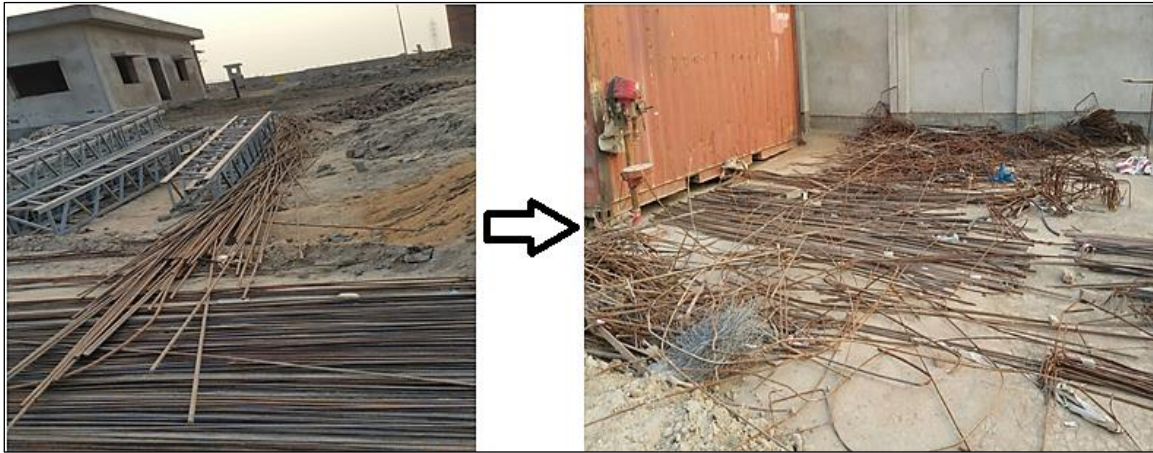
Reinforcement (Steel) before the Laying of Foundation at Site-I and Steel Waste That was Generated Afterwards.
